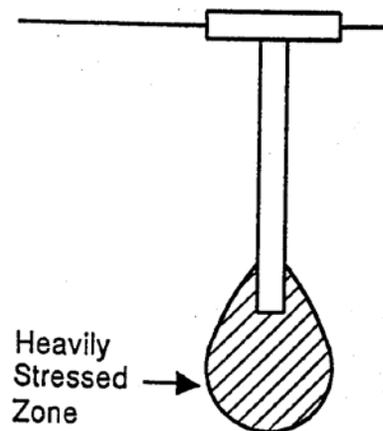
Stressed Zone Under End Bearing Single Pile
